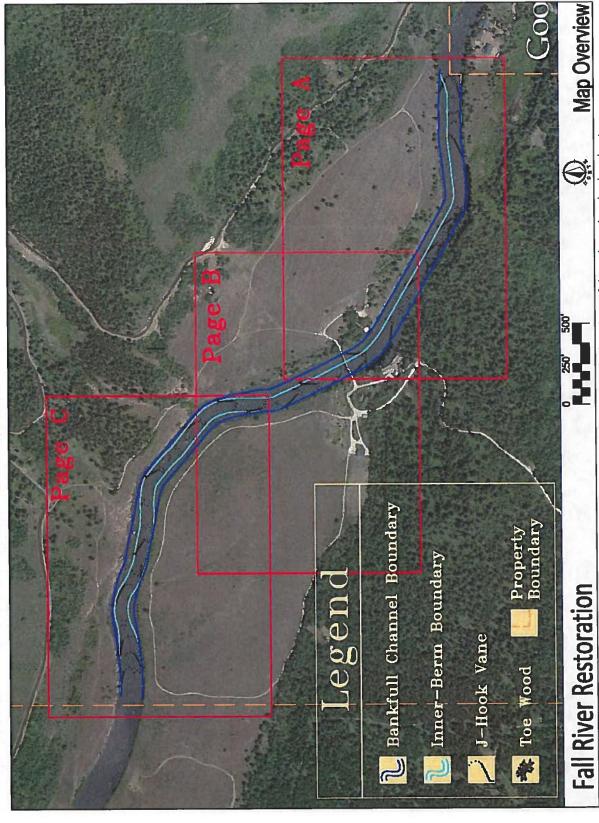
Proposed plan view layout and delineation of page breaks that indicate the locations of the enlarged-scale plan sheets.
